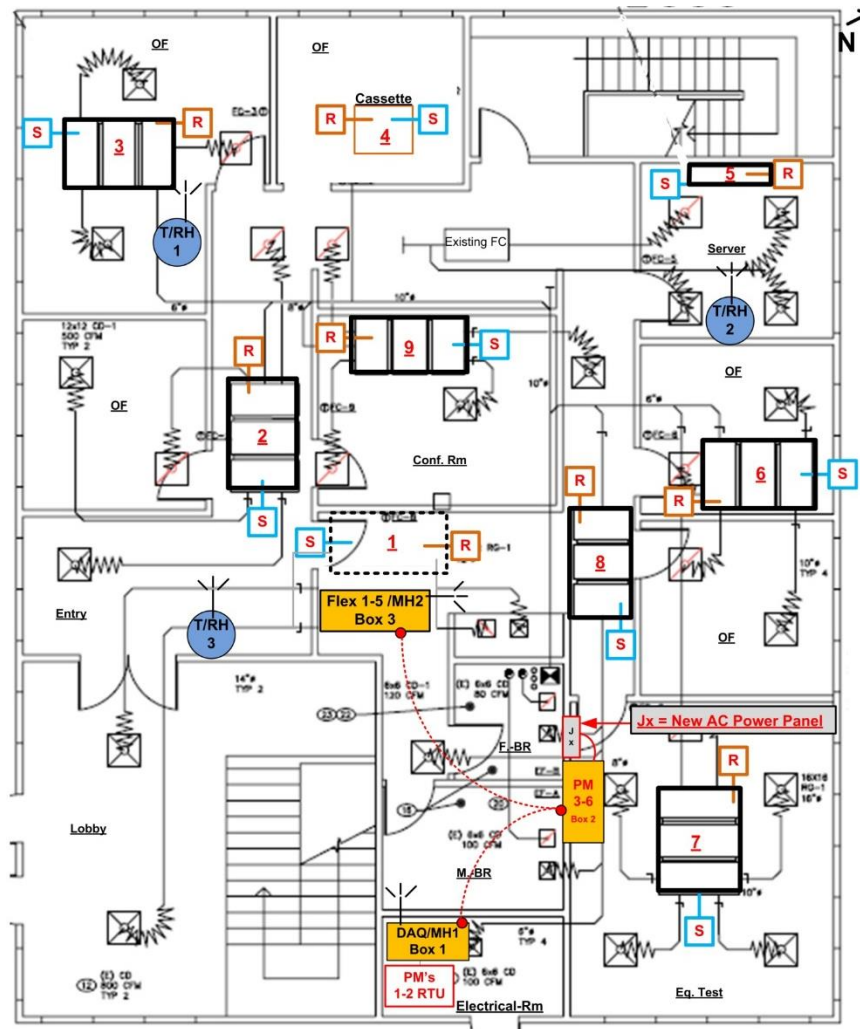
FIRST FLOOR DATA ACQUISITION PLAN
